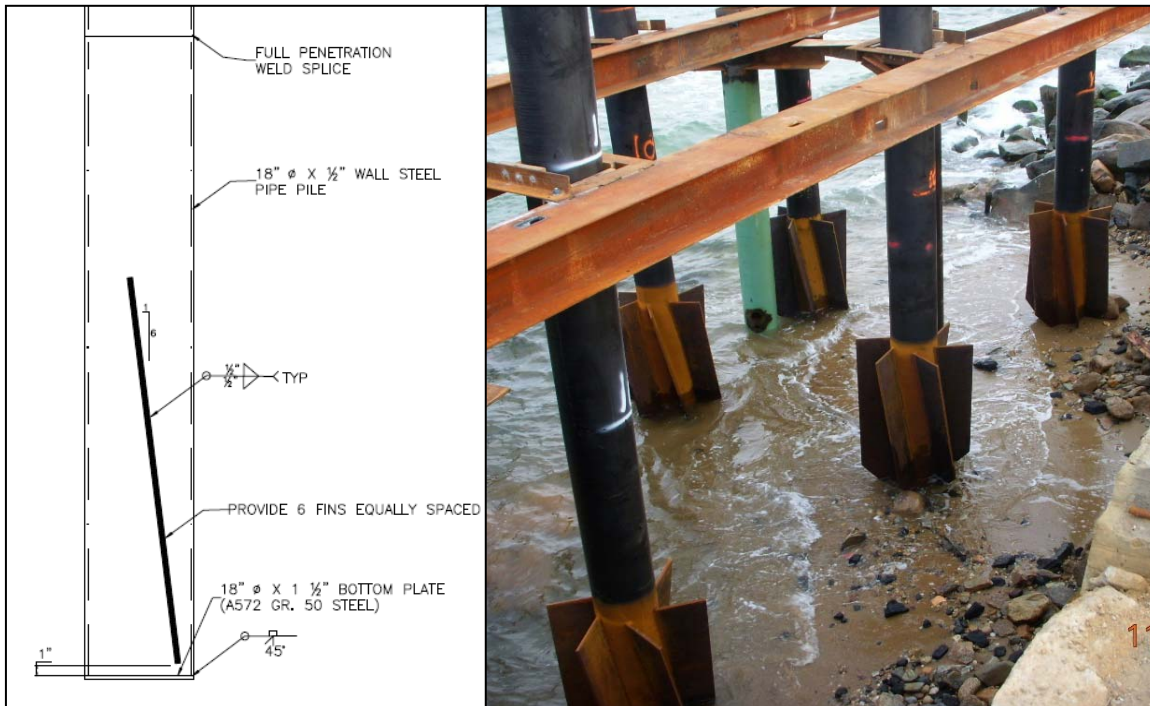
and 10 – Tapertube™ Pile Detail and Photos (photo courtesy of GTR)
